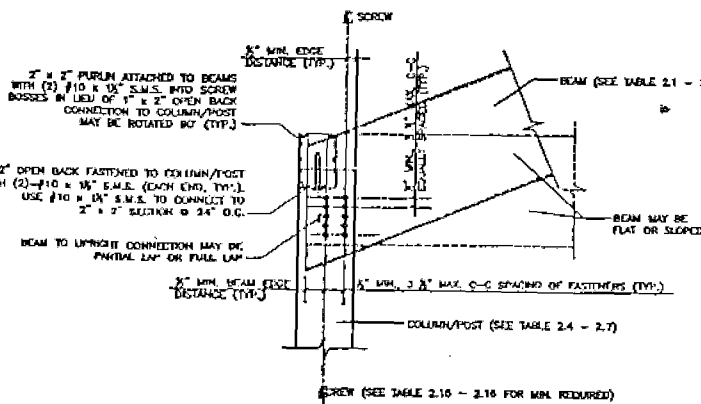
TYPICAL PURLIN TO BEAM CONNECTION
